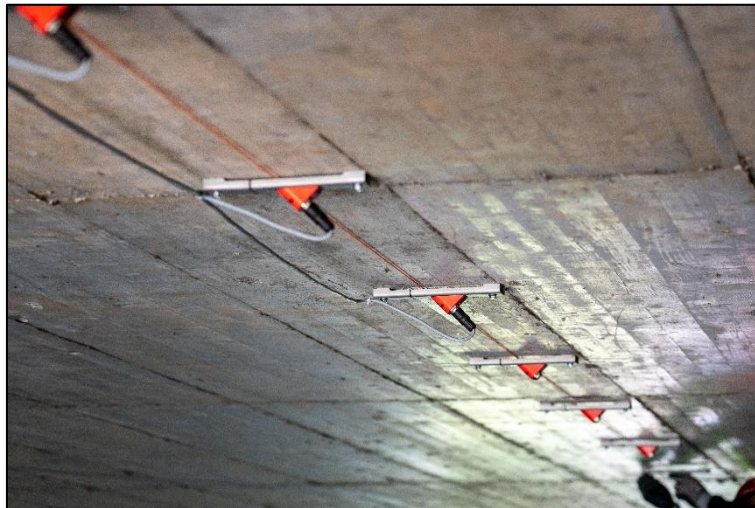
Bridge WIM sensors installed under the bridge (Source: Cestel).
